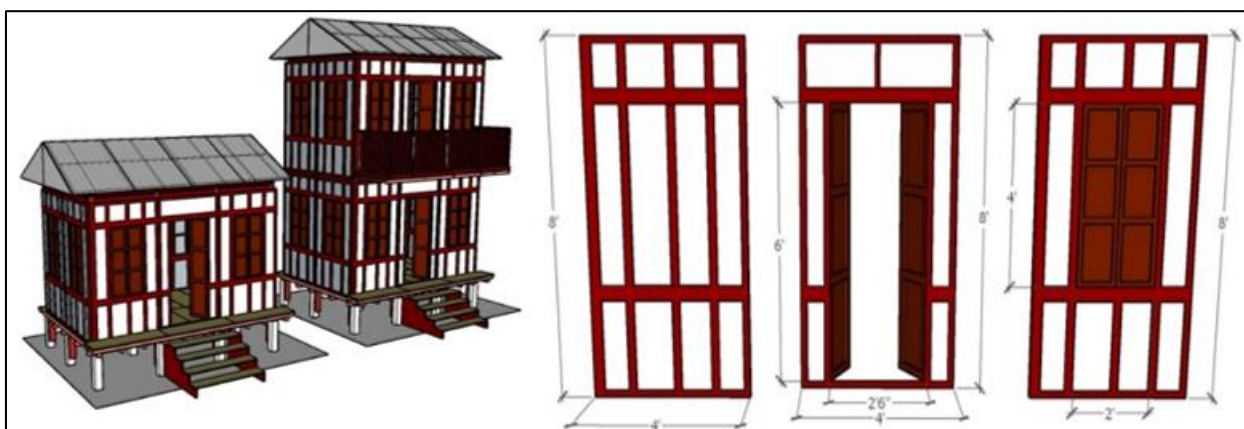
4'8' Modular Panel Integration in the Munshiganj Modular House (Source:Author).
